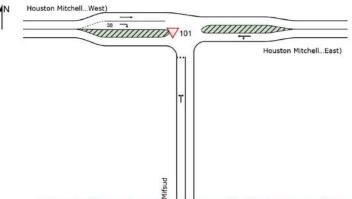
Proposed Intersection with Houston Mitchell Drive - Concept Layout.
